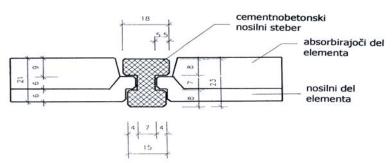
Details of joining of double-layer cement concrete noise protection structure on a cement concrete supporting pillar
